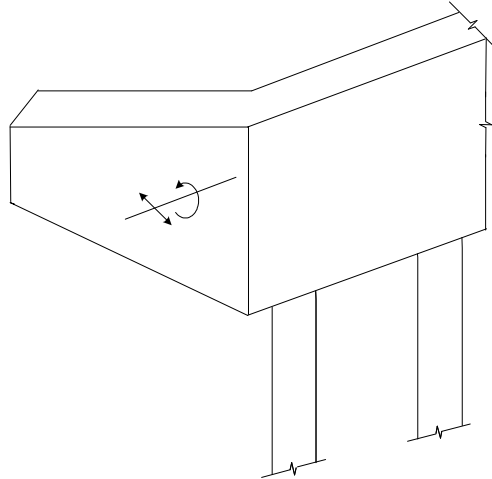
Simple diagram of an FIAB with a cantilevered flared wingwall
